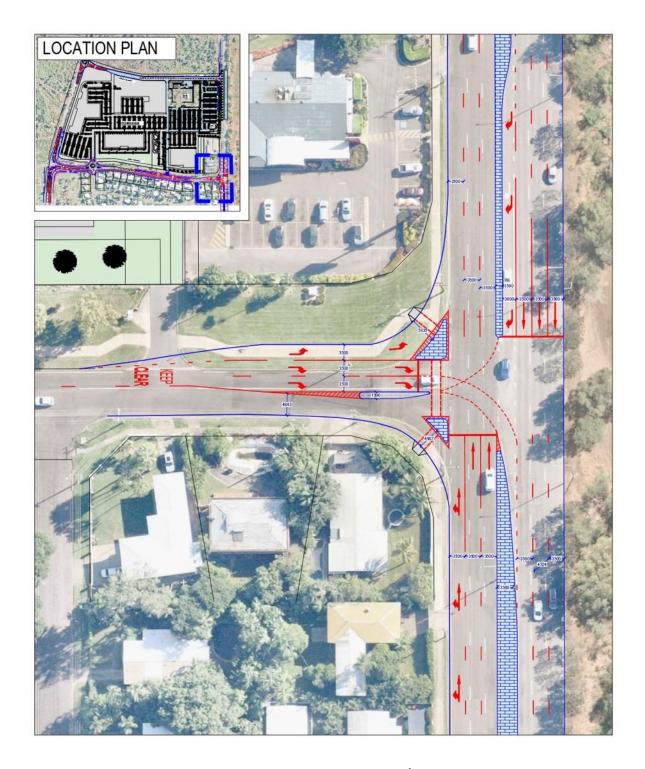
PROPOSED LAYOUT OF THE BAGOT ROAD / FITZER DRIVE INTERSECTION (TRAFFIC SIGNALS)
